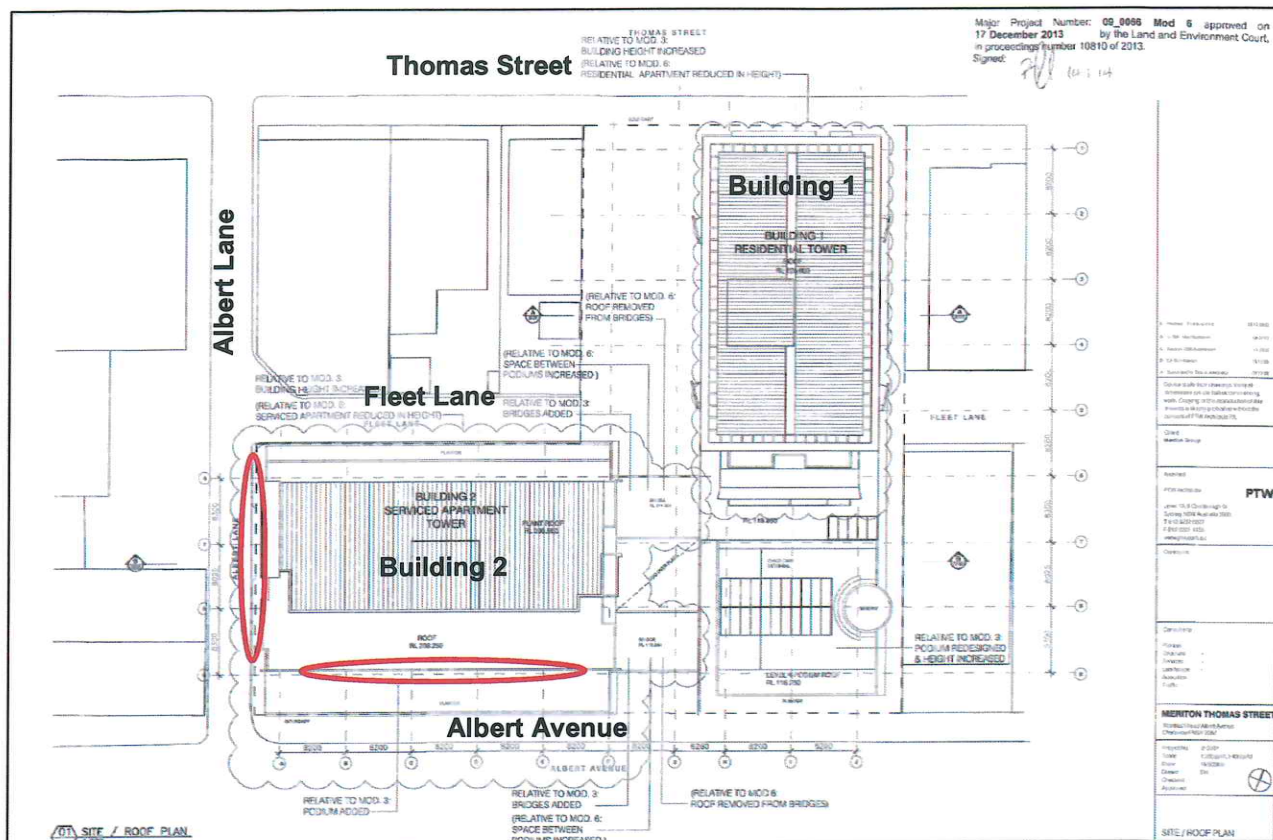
Approved Site Plan identifying proposed location of building identification signs (show in red) on Building 2.
